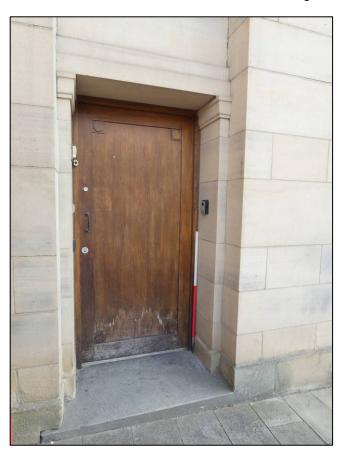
West elevation, staff entrance at north end, looking SE (photo 719).
